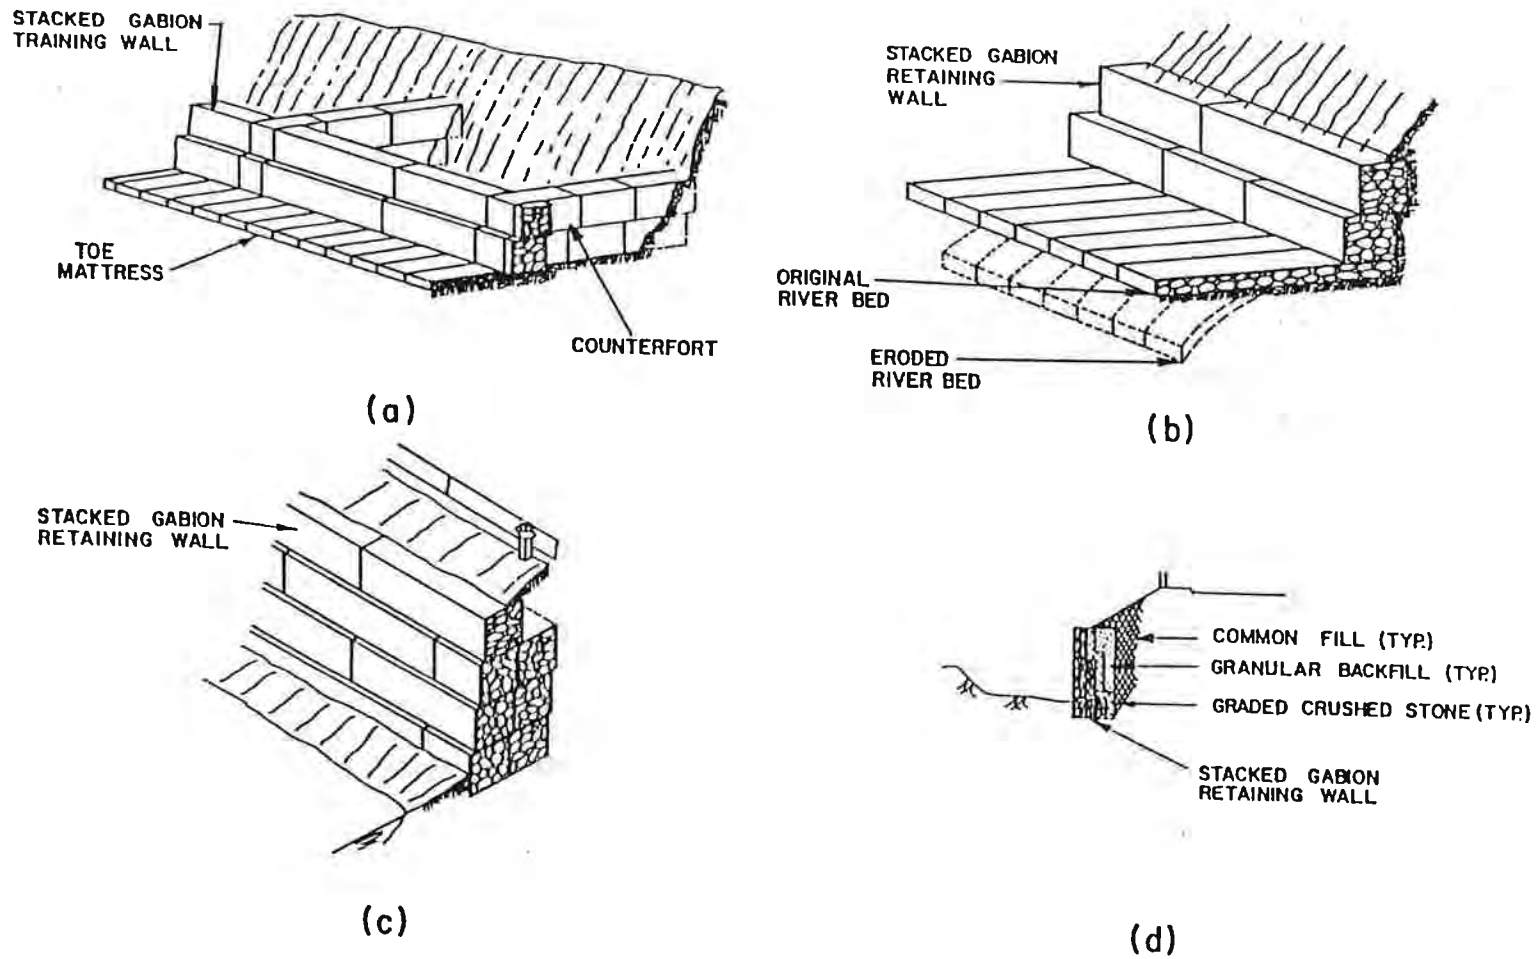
Typical stacked block gabion revetment details: (a) training wall with counterforts; (b) stepped back low retaining wall with apron; (c) high retaining wall, stepped-back configuration; (d) high retaining wall, batter type (after Brown and Clyde, 1989).
